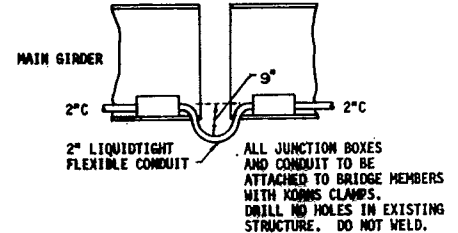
DETAIL SHOWING ARRANGEMENT SIGNAL BRIDGE CONTROLS
